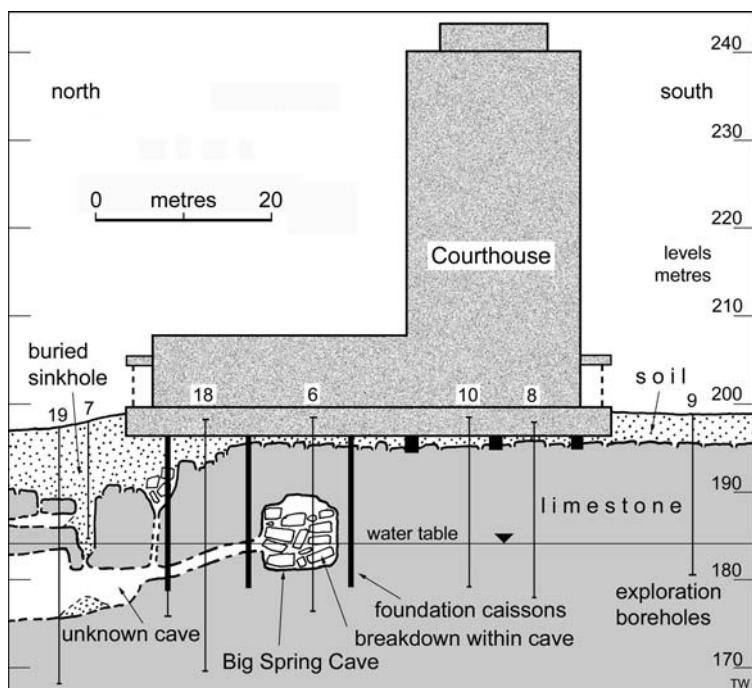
Cross section, drawn along the eastern edge of the Madison County Courthouse building, showing its asymmetrical profile designed in response to the cavernous ground beneath the northern half of the site.
